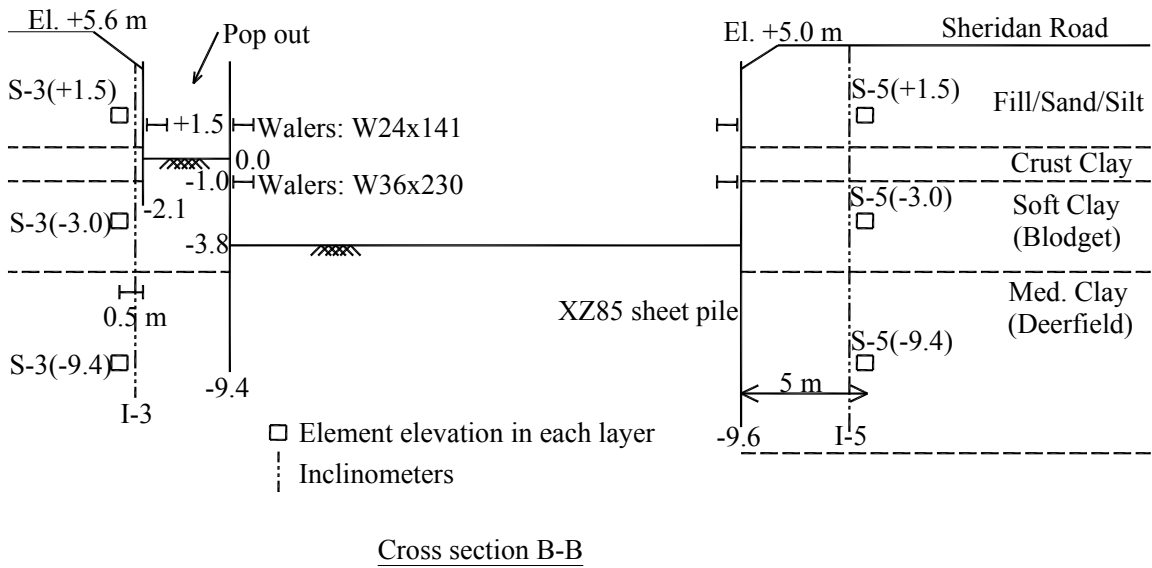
Southward facing section, Ford Center excavation, modified after Blackburn (2005)
